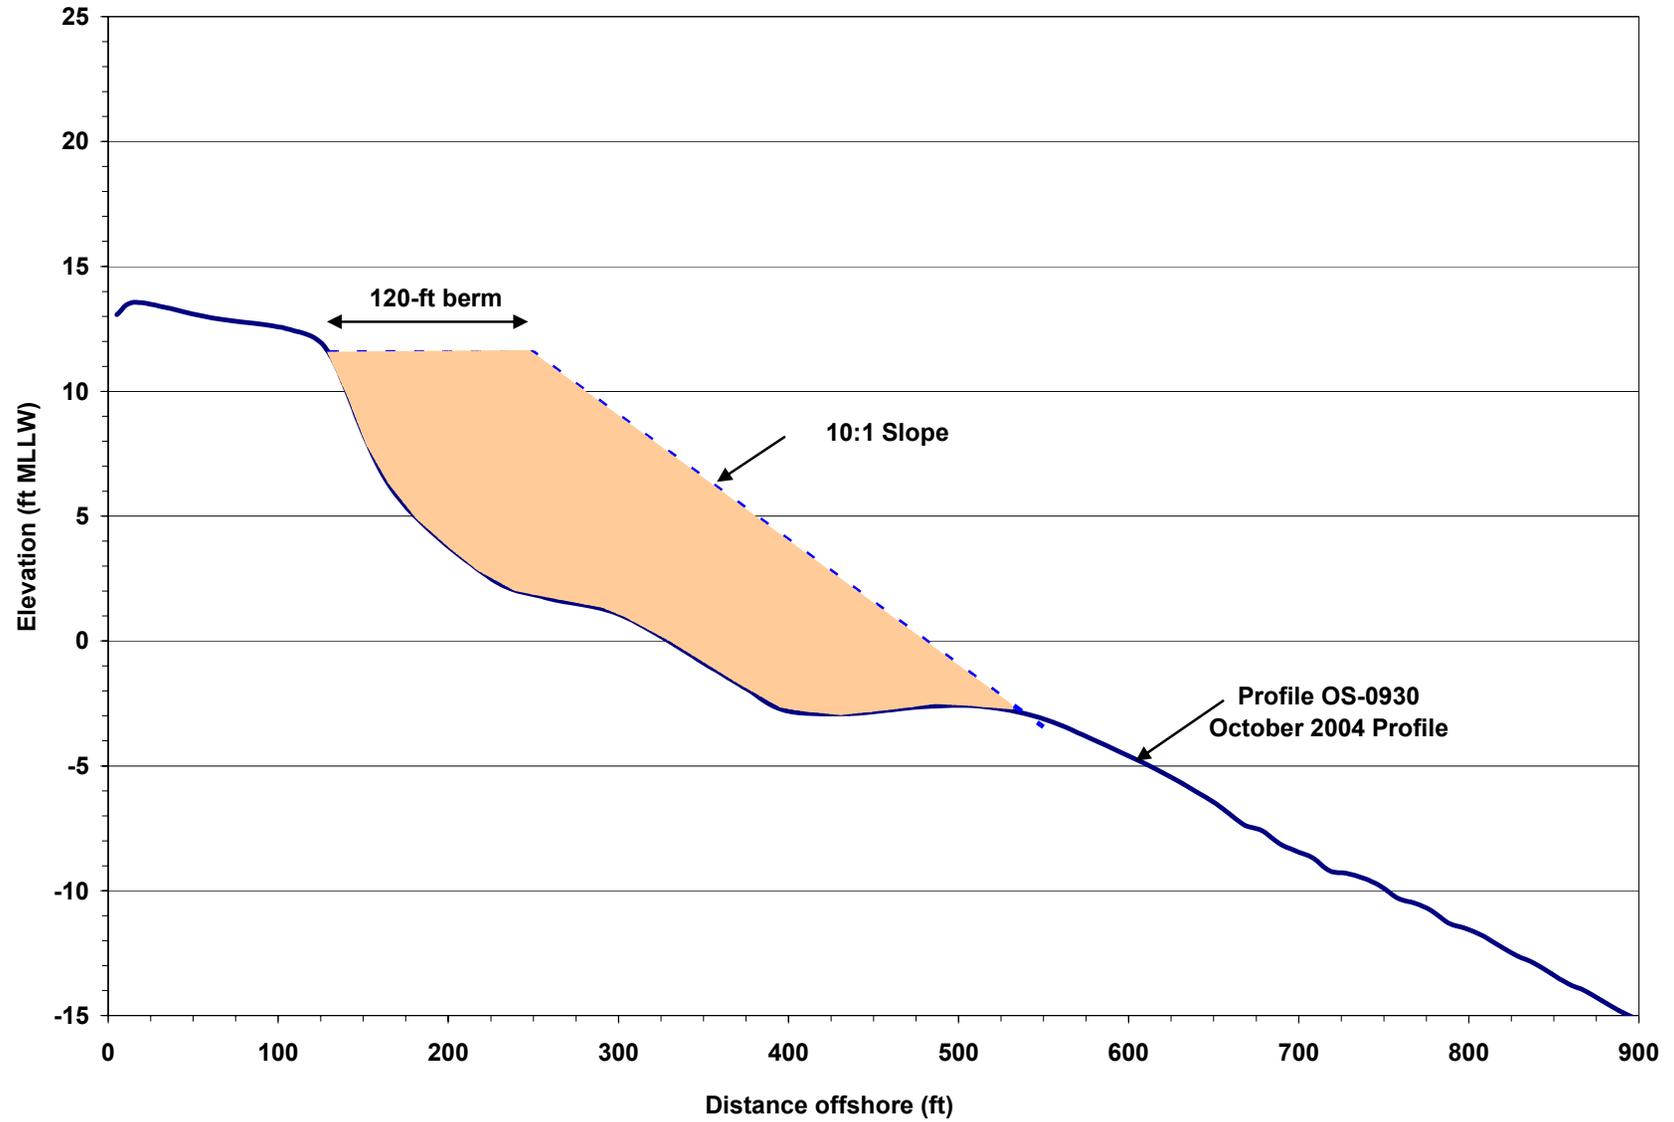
Cross-Section of the Beach Berm Placement Method at the South Oceanside Site
